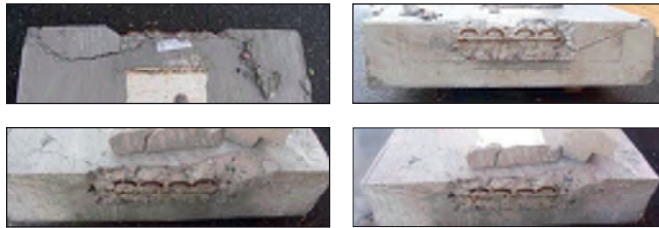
Photos of shear key type 1 after failure in the concrete covering layer.
